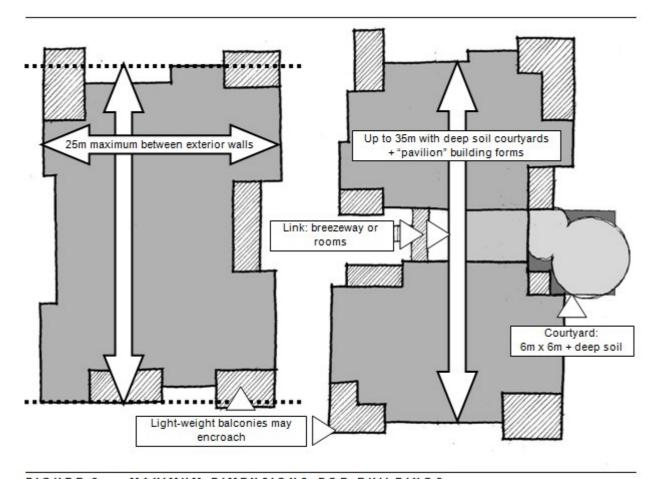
MAXIMUM DIMENSIONS FOR BUILDINGS
